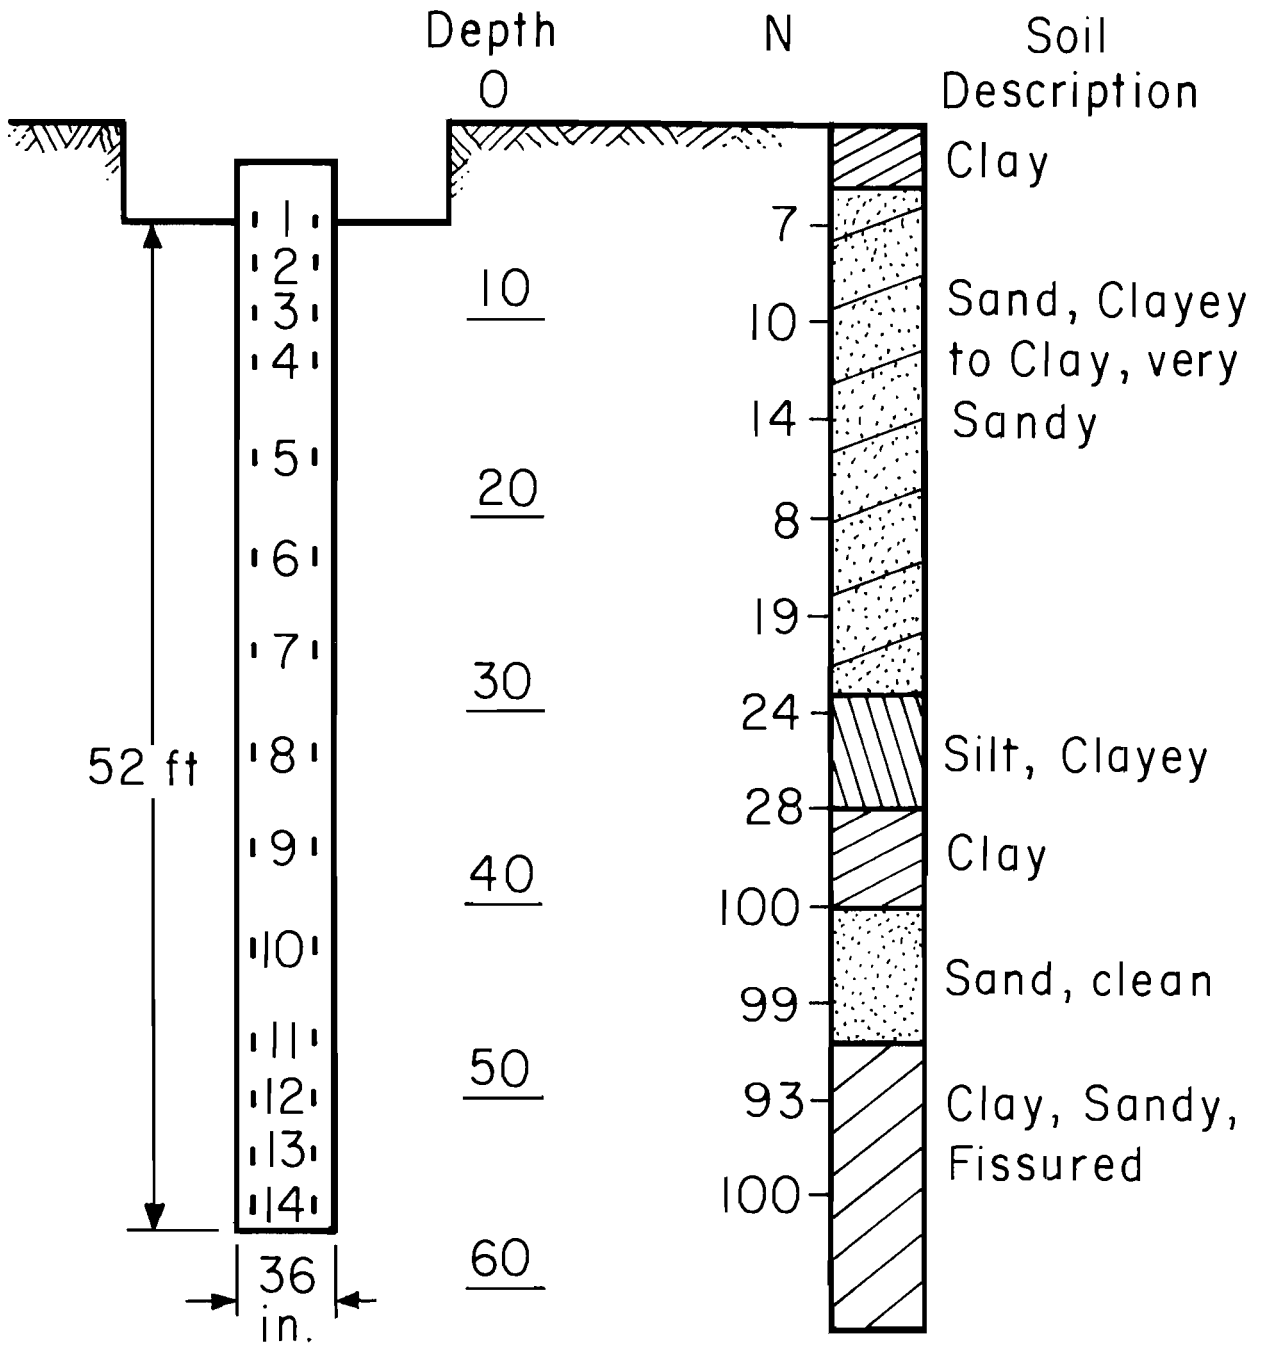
Soil Profile and Shaft Instrumentation for Test 2
